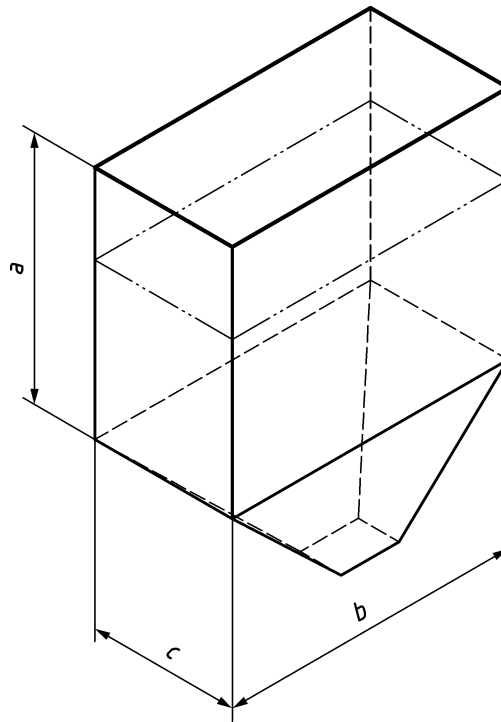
Typical arrangement of a plate assembly, composed of individual panels, that is unstiffened or stiffened plates
